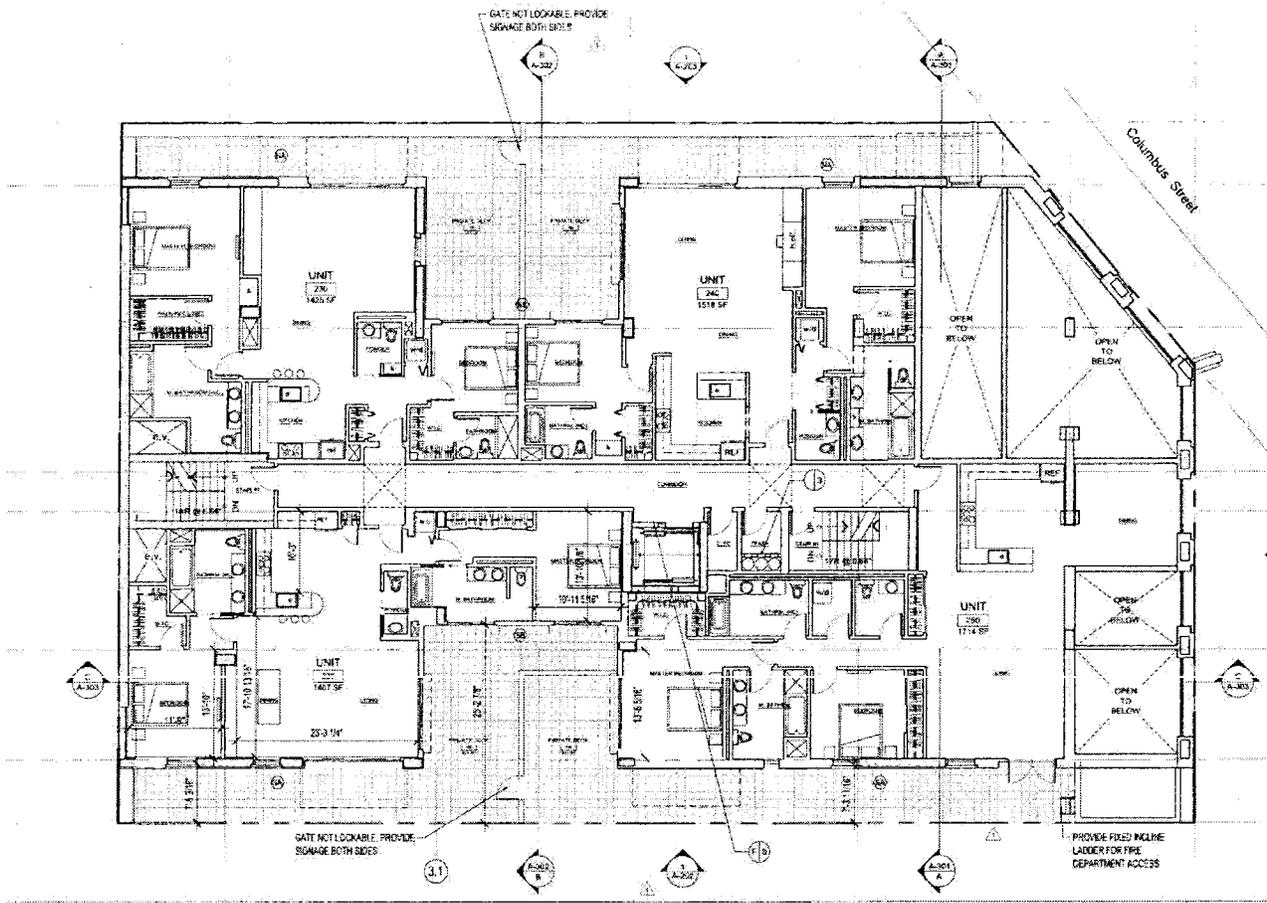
PROPOSED 1731 POWELL ST SECOND LEVEL PLAN
